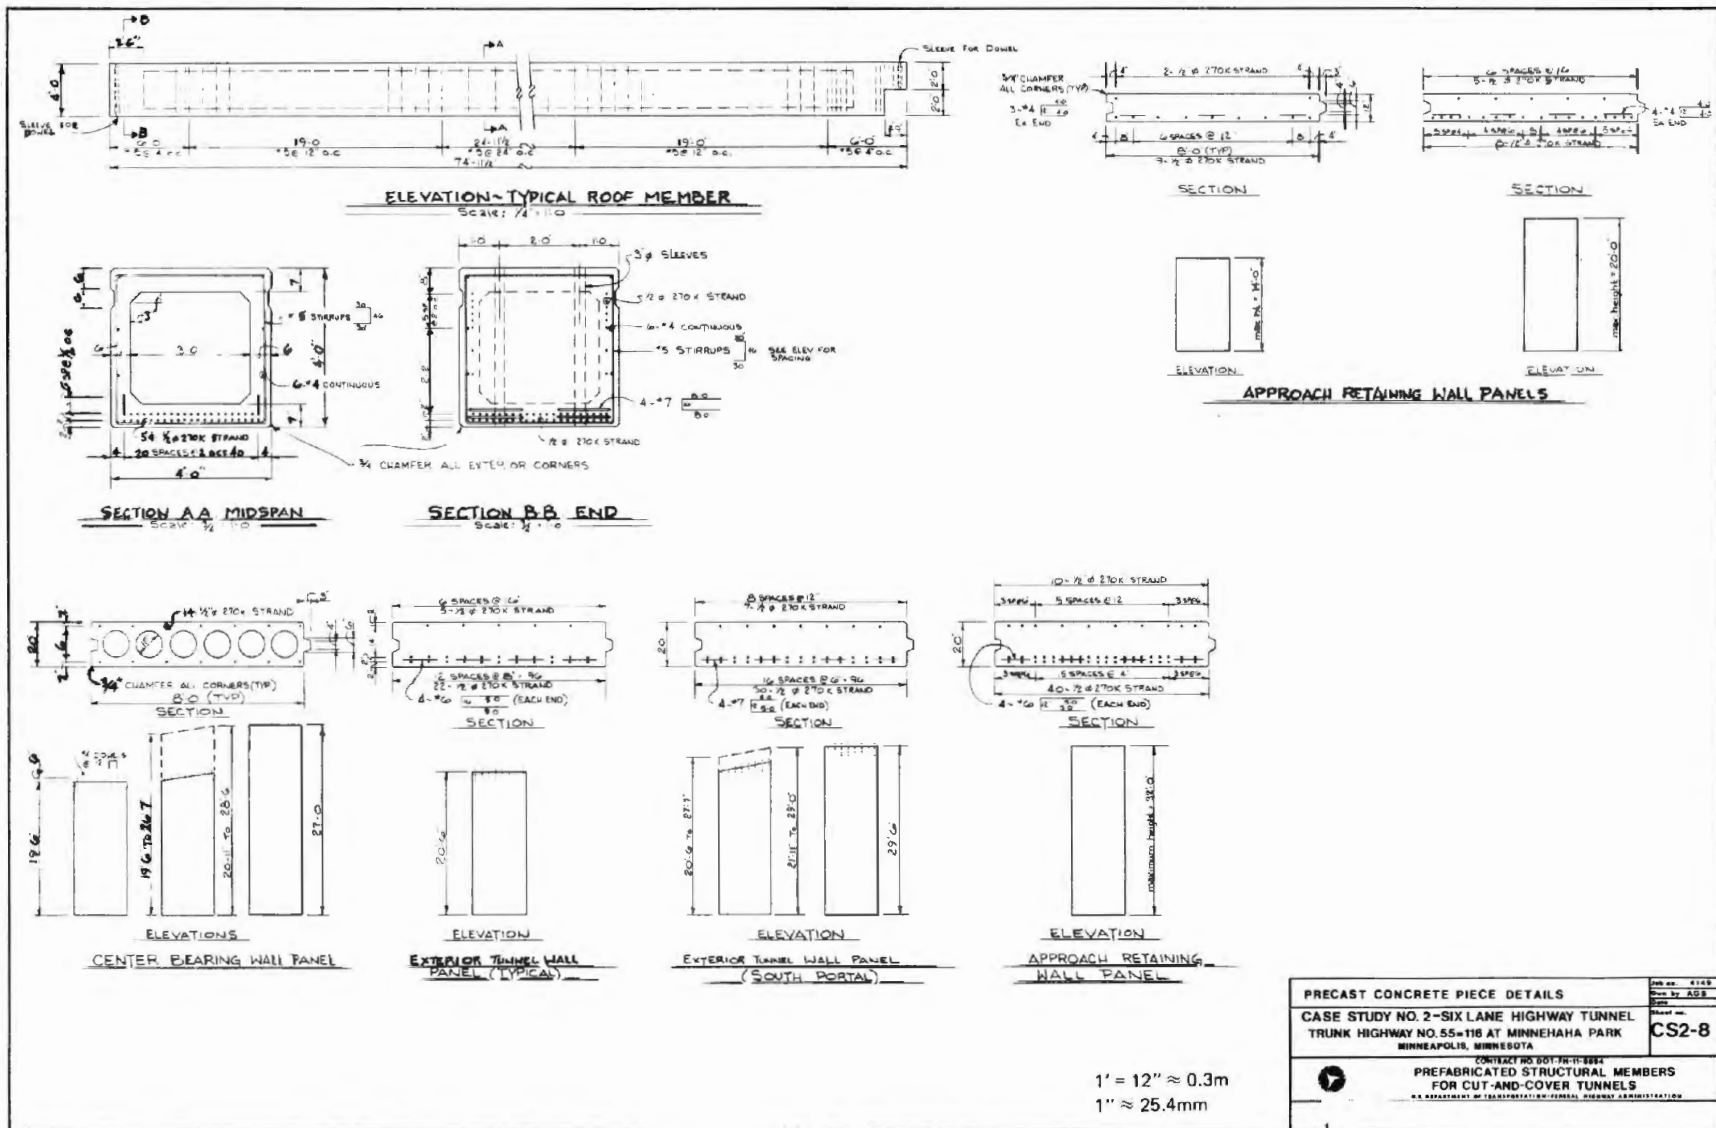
Case Study 2: Precast concrete construction. Sections & details
